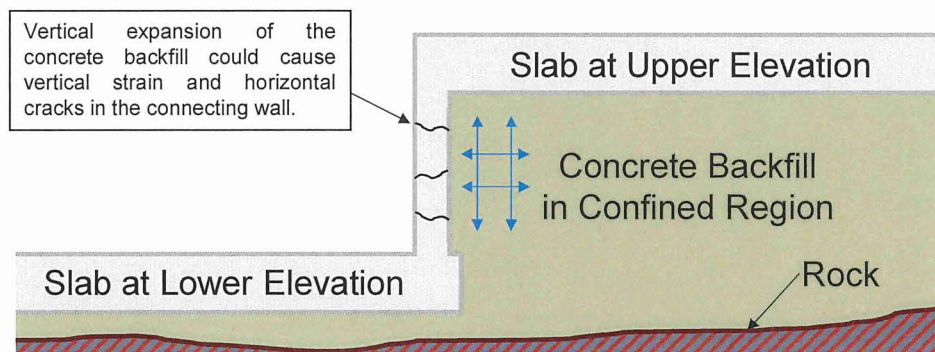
Structural Cracks due to Concrete Backfill Expansion.
